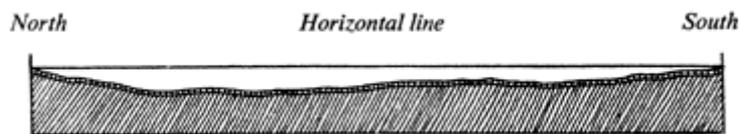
Section of the subsided floor of a room, paved with tesserae, at Silchester. Scale 1/40.
